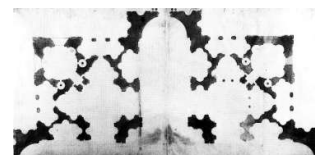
Floor plan of Bramante (*The architecture of St Peter's Basilica, sd*)
